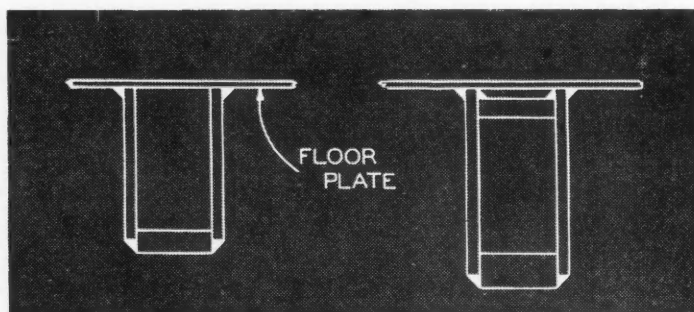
The fabricated-beam section developed after a thorough study of standard shapes.
